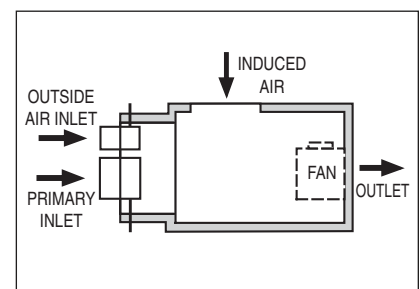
Outside Air Inlet Fan Powered, Series (Plan View)
